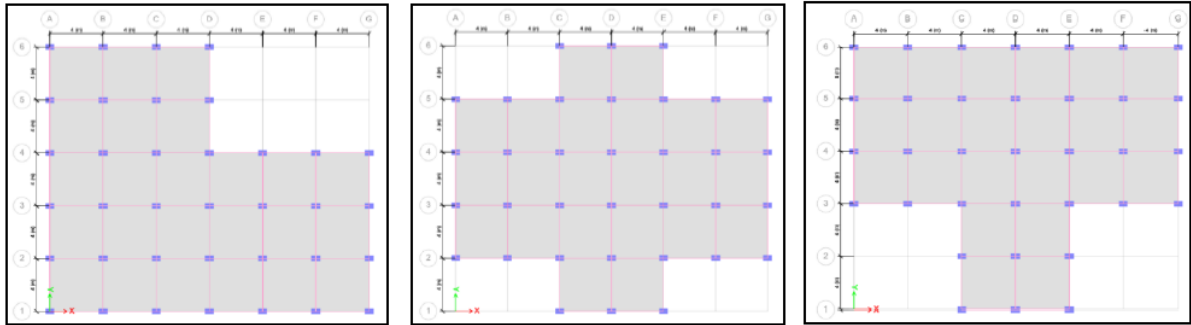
Plan of L, Plus and T Shaped RCC building without bracing and shear wall
